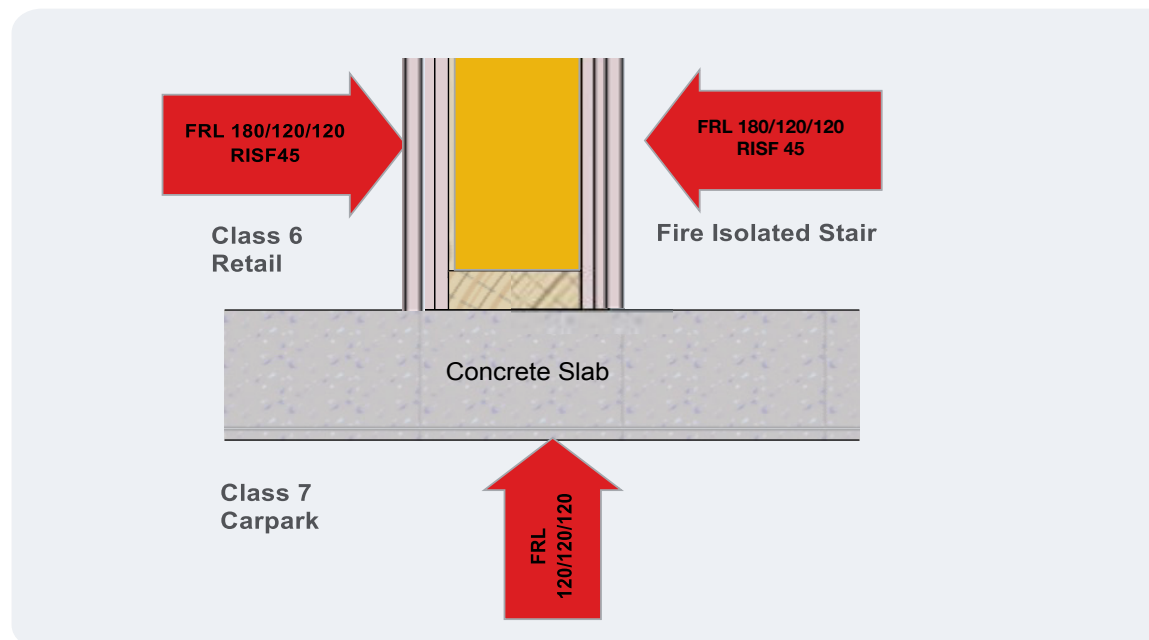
Typical FRL requirements for Class 6 and Class 7 parts (Lightweight timber-framed construction)
